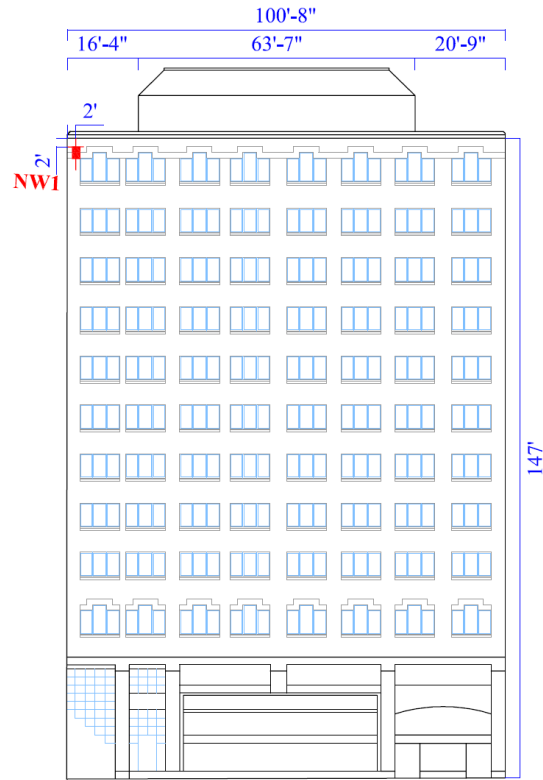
North-west elevation of FB Building with driving rain gauge locations
